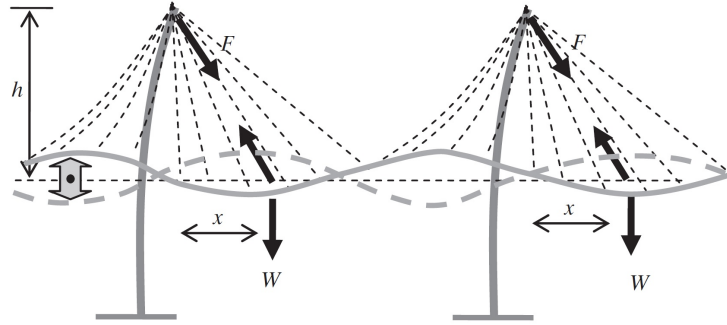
Coupled longitudinal and vertical mode of a cable-stayed bridge (CALVI ET AL , 2013)
